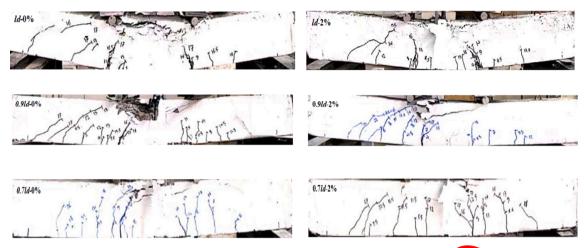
Cracks propagation and failure mode of the specimens with lap-spliced bars doing.
